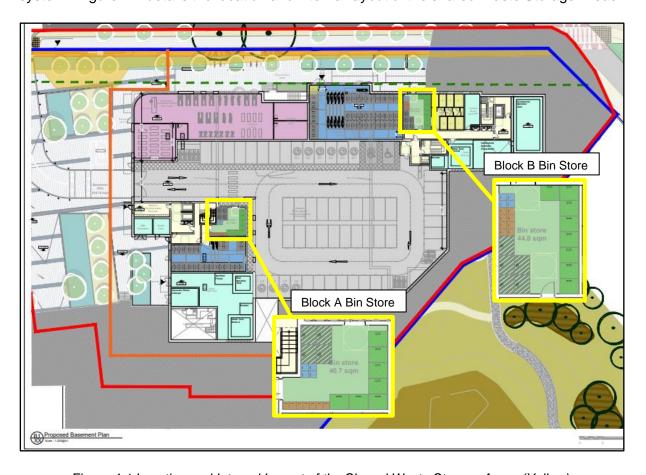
Location and Internal Layout of the Shared Waste Storage Areas (Yellow)
